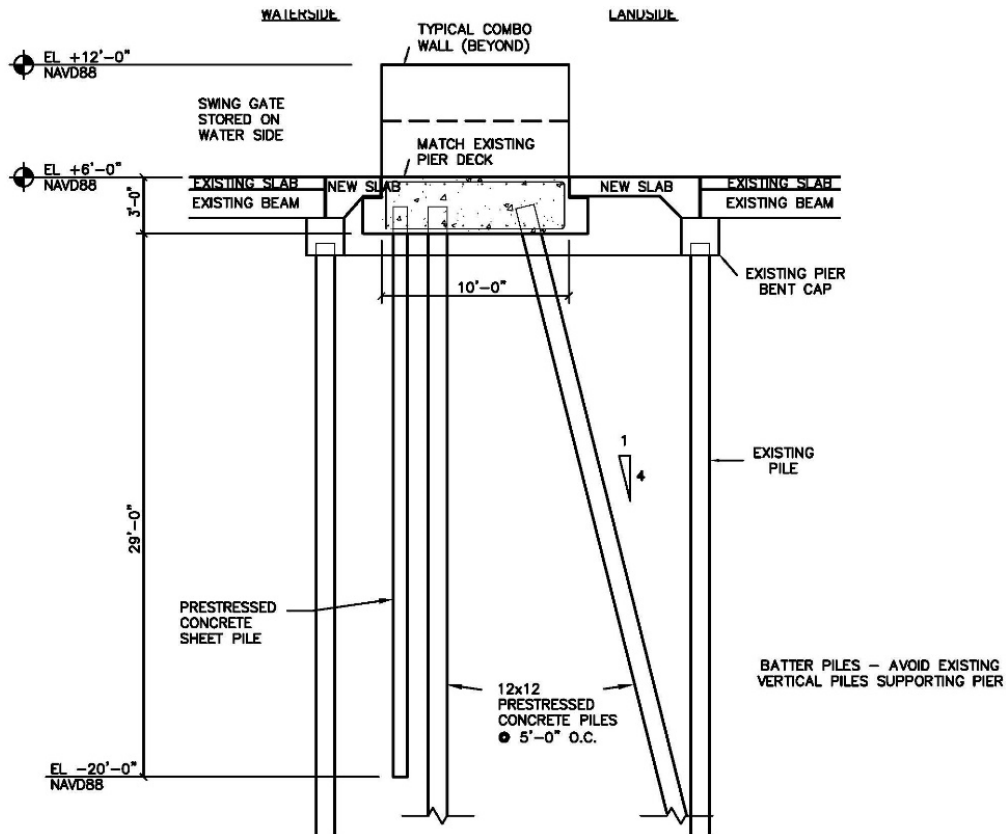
Typical section of Combo Wall Crossing Coast Guard Dock
